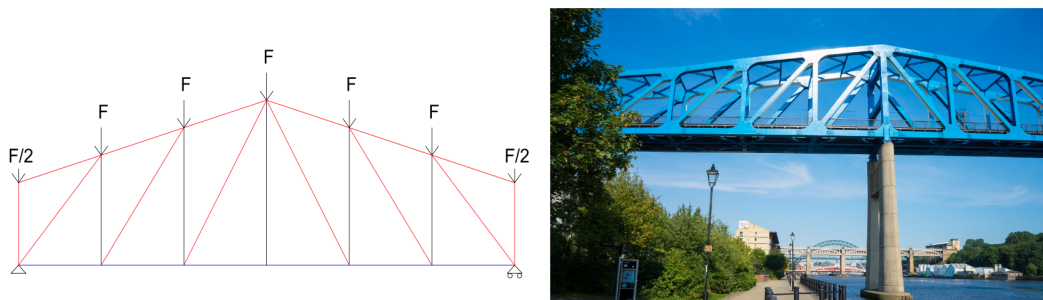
Howe truss scheme and application example: Queen Elizabeth II Metro Bridge
